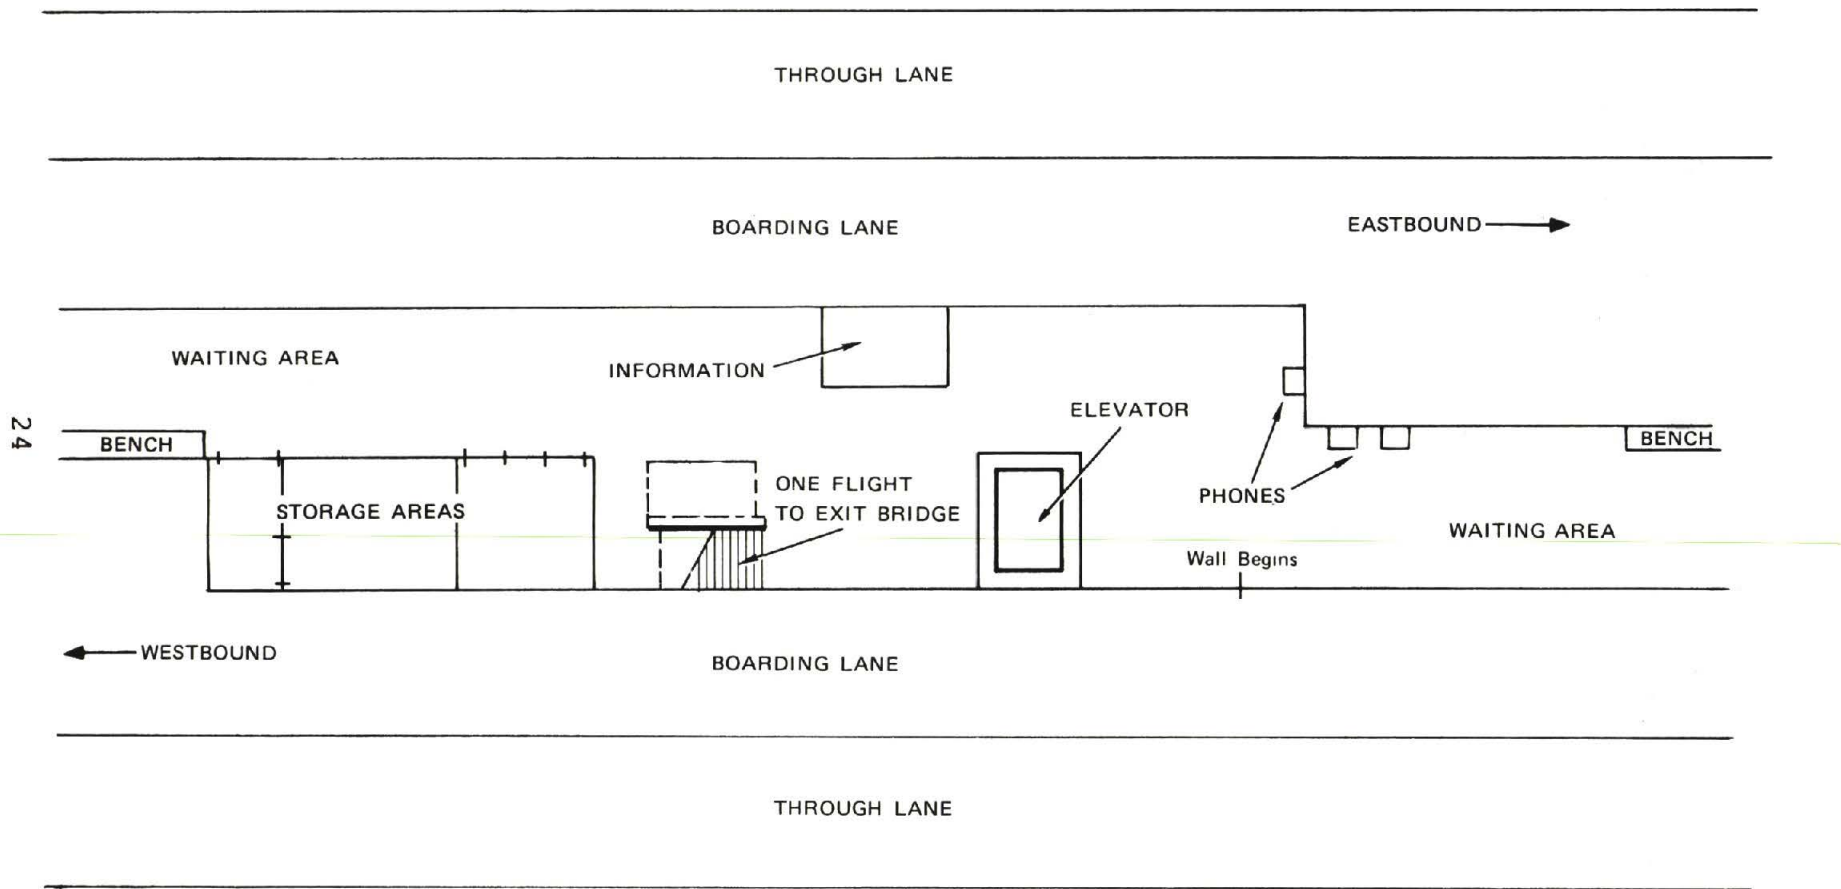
HOSPITAL STATION, PLAN VIEW
